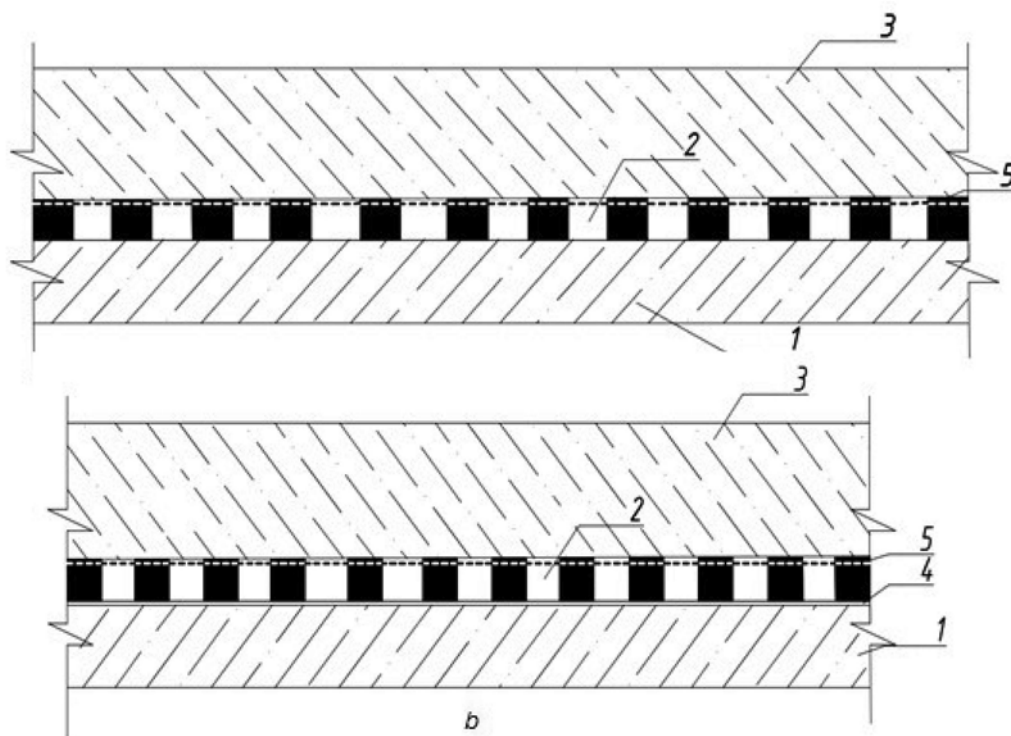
Seamless waterproofing of the buckle plate with sprayed compositions with double-sided adhesion: a – without underlay; b – with underlay of non-woven geotextile; 1 – concrete preparation; 2 – waterproofing layer; 3 – buckle plate; 4 – underlay of non-woven geotextile; 5 – non-woven geotextile, reinforcing the surface layer of waterproofing coating.
